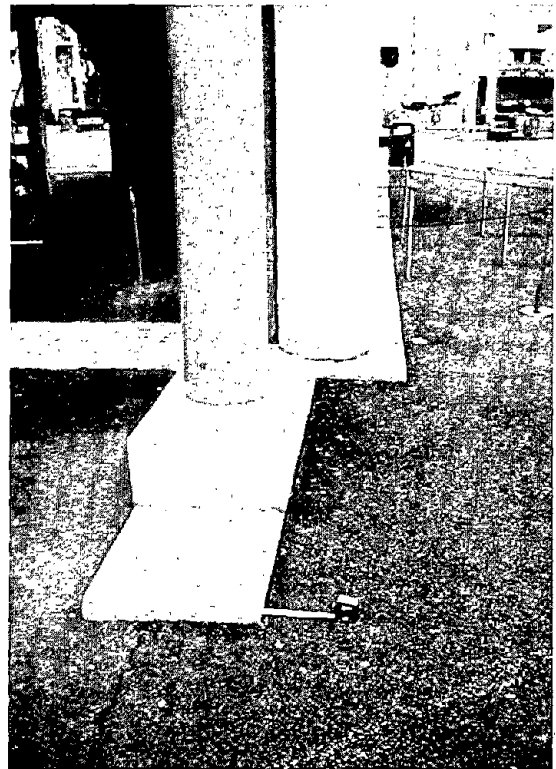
Small separation between pavement and concrete in the amusement park.
